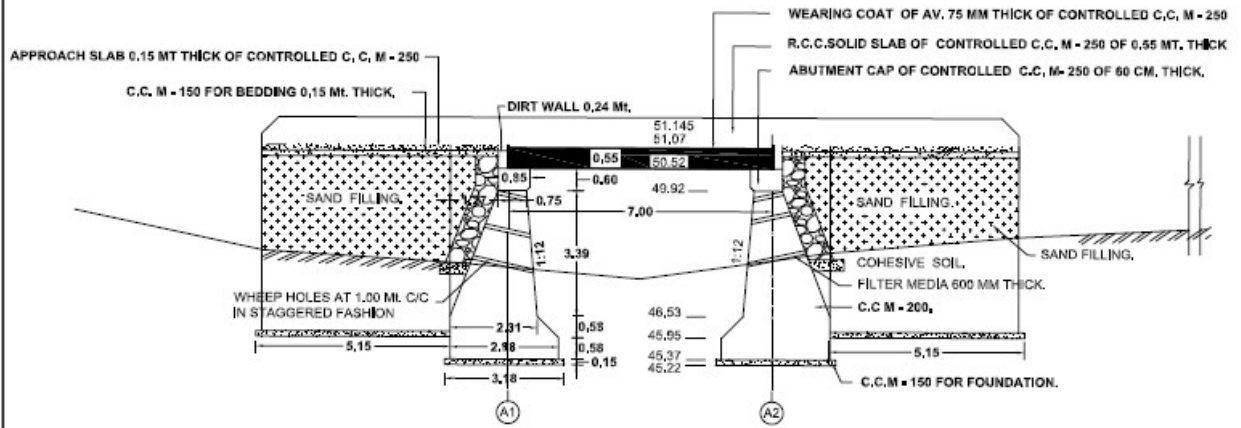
TYPICAL CROSS SECTION FOR MASS CONCRETE PIER & ABUTMENTS
